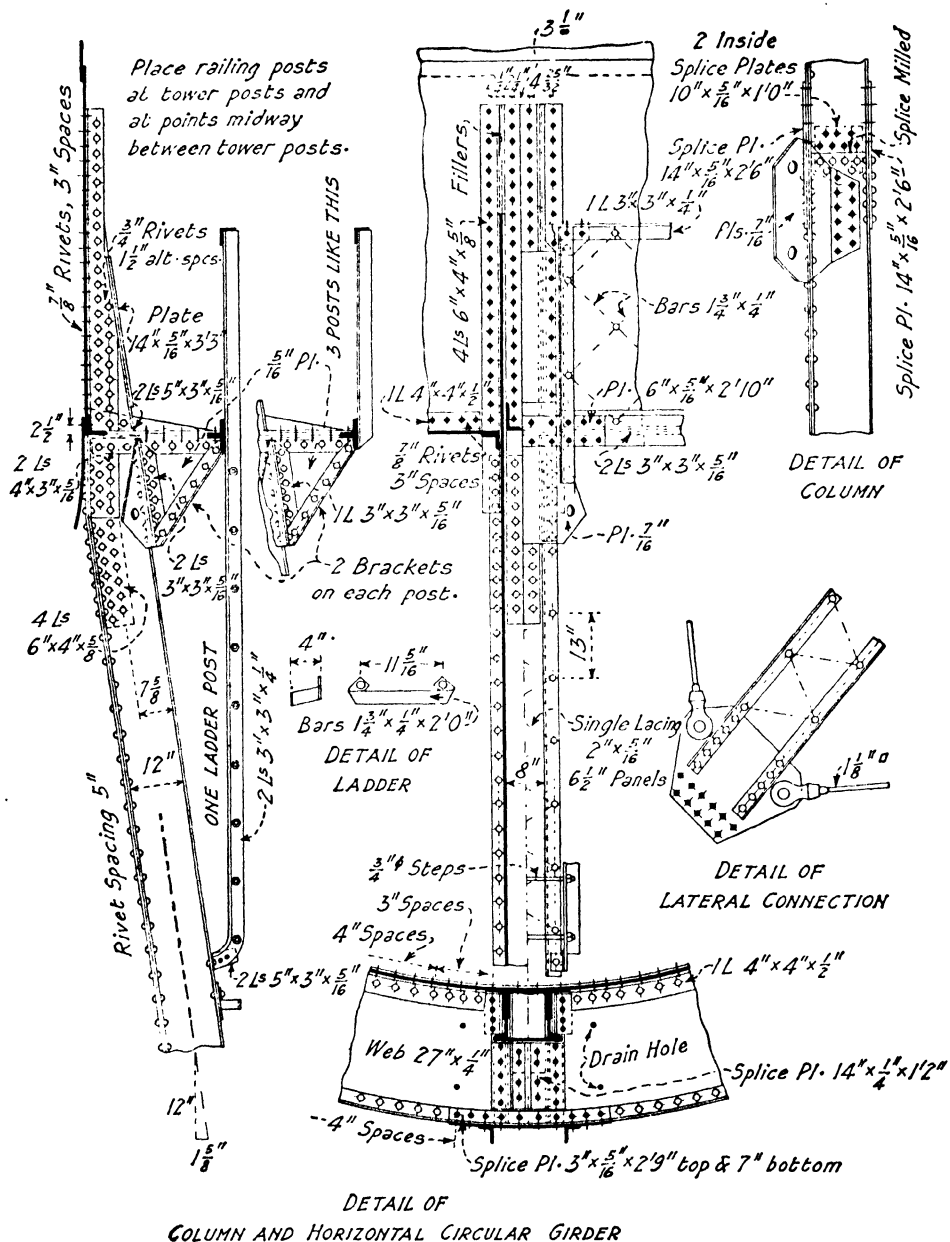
ELEVATED TANK AND TOWER, JACKSON, MINN.
